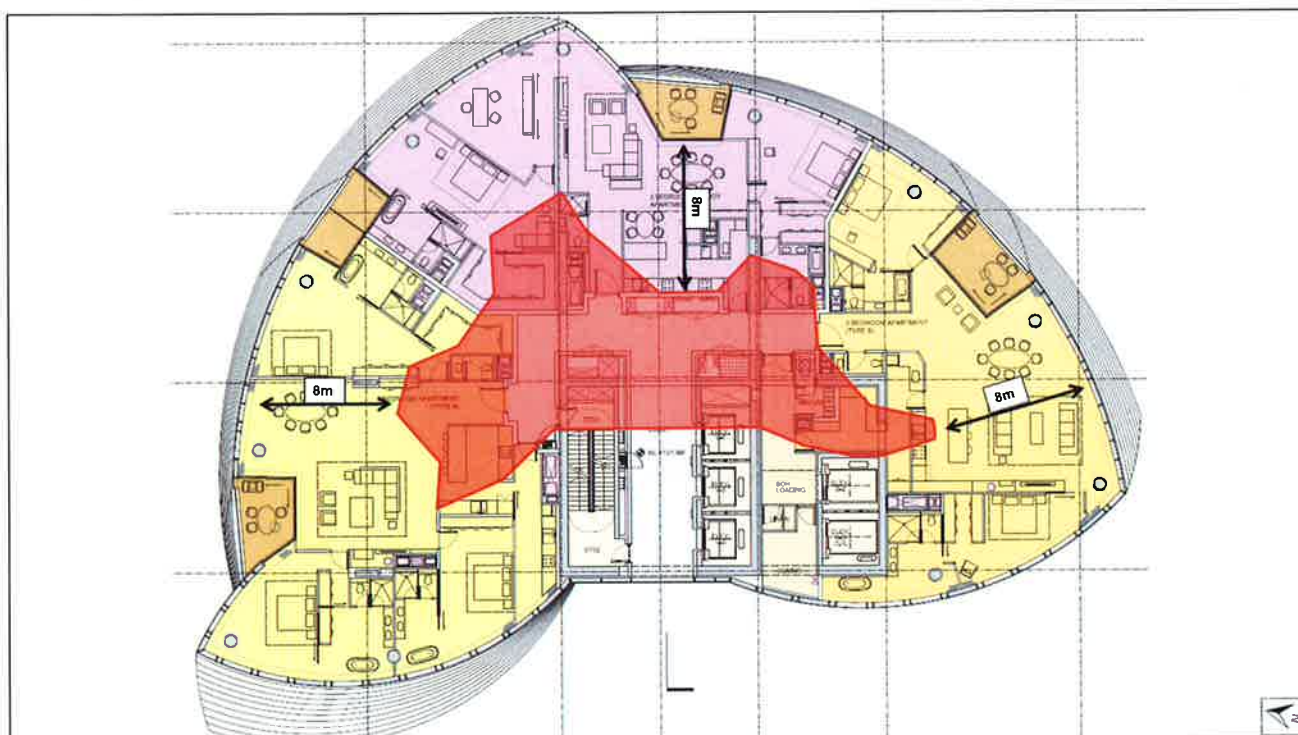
Typical floorplan (Level 34), areas further than 8m from a window highlighted in red (Base source: Applicant's EIS)
